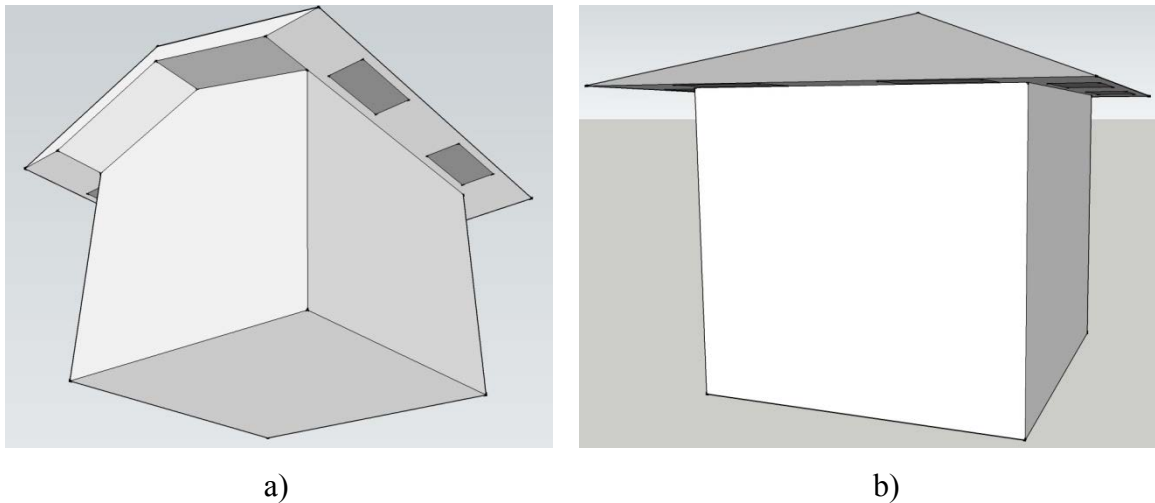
Schematics of the test building: a) gable roof model; b) hip roof model
